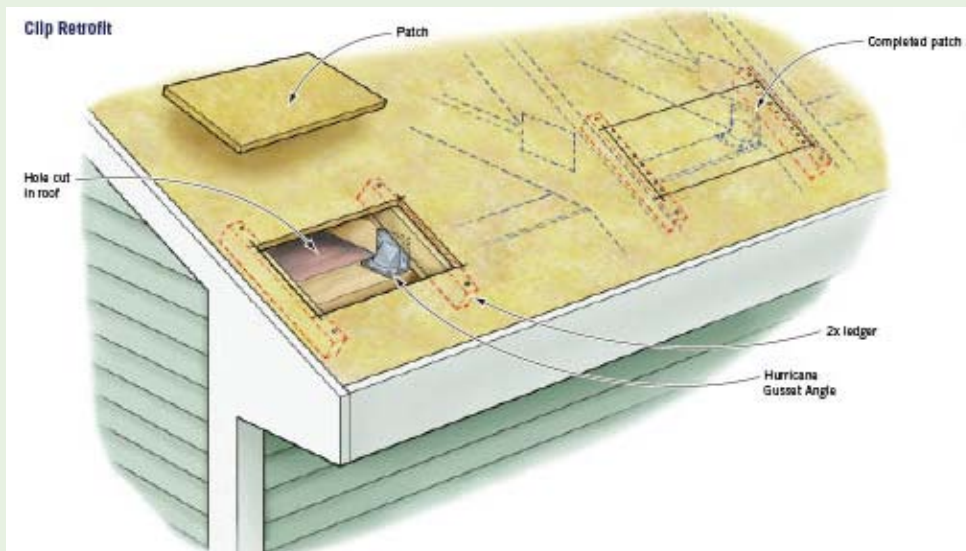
To install connectors with minimal demolition, cut rectangular holes between pairs of trusses. A connector can be attached to a truss on each side of the hole, allowing four trusses to be attached with just two holes. Holes are patched by resting the patch on scabs nailed to the sides of the trusses. Source: Coastal Contractors Online
